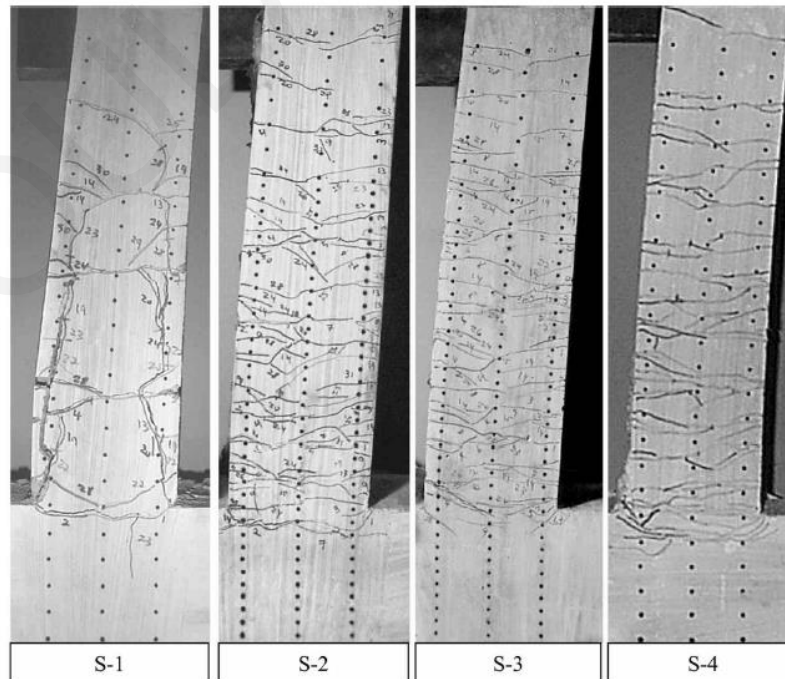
Deflected shape and damage pattern of specimens at 7% drift [163]
